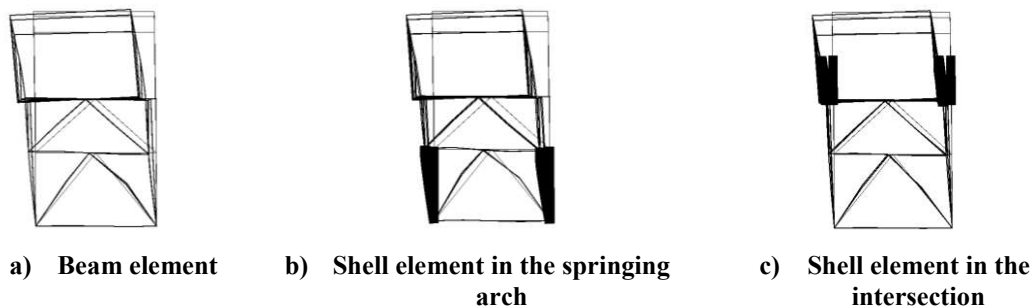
The deformation in Y-Z view for loading in transverse direction of the bridge model
